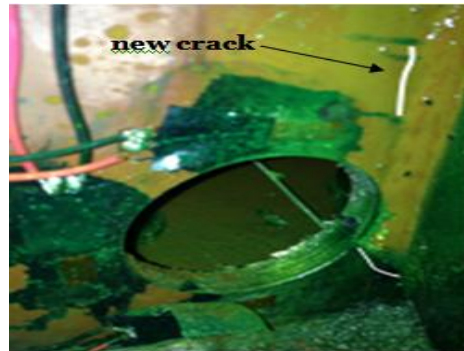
Cracking forming after the first pair of crack-arrest holes had been drilled and tested (Segment 2)
